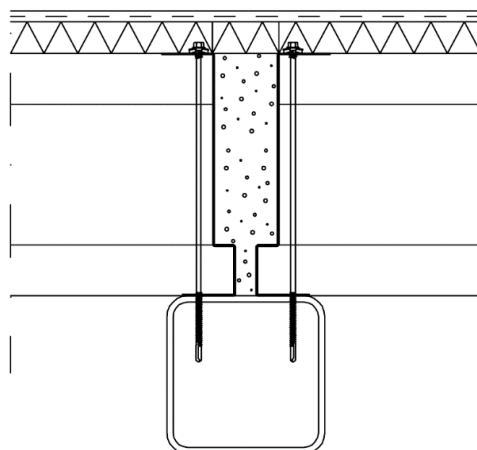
Connections between long span composite panel and primary structure [138]
